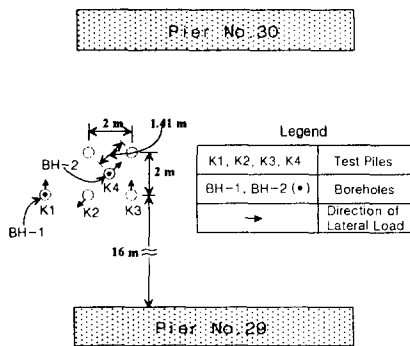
Plan View of Test Piles Arrangement and Borehole Locations (K-Bridge Site)
